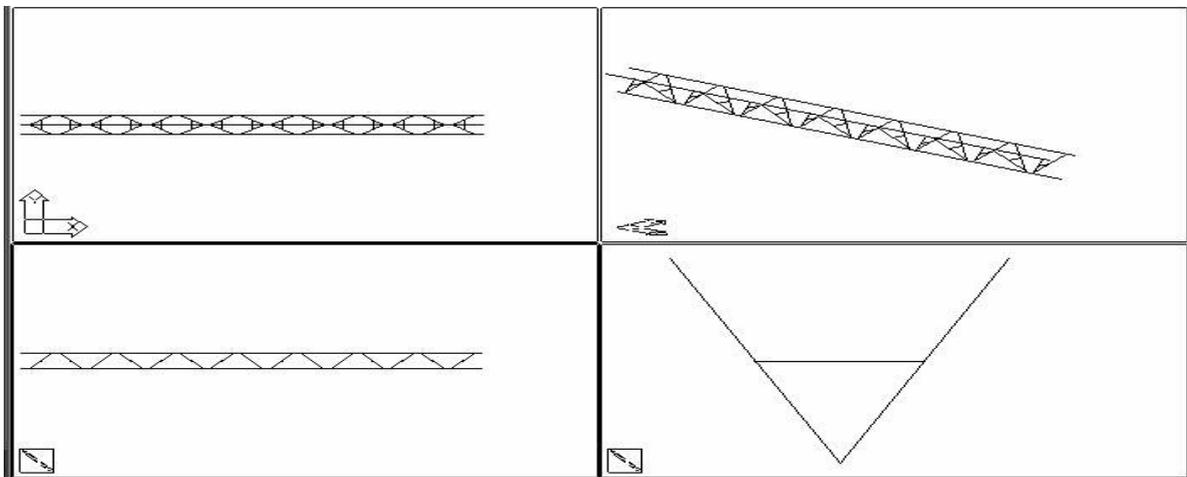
Geometry model of the 6 m section-frame developed using AutoCAD.
